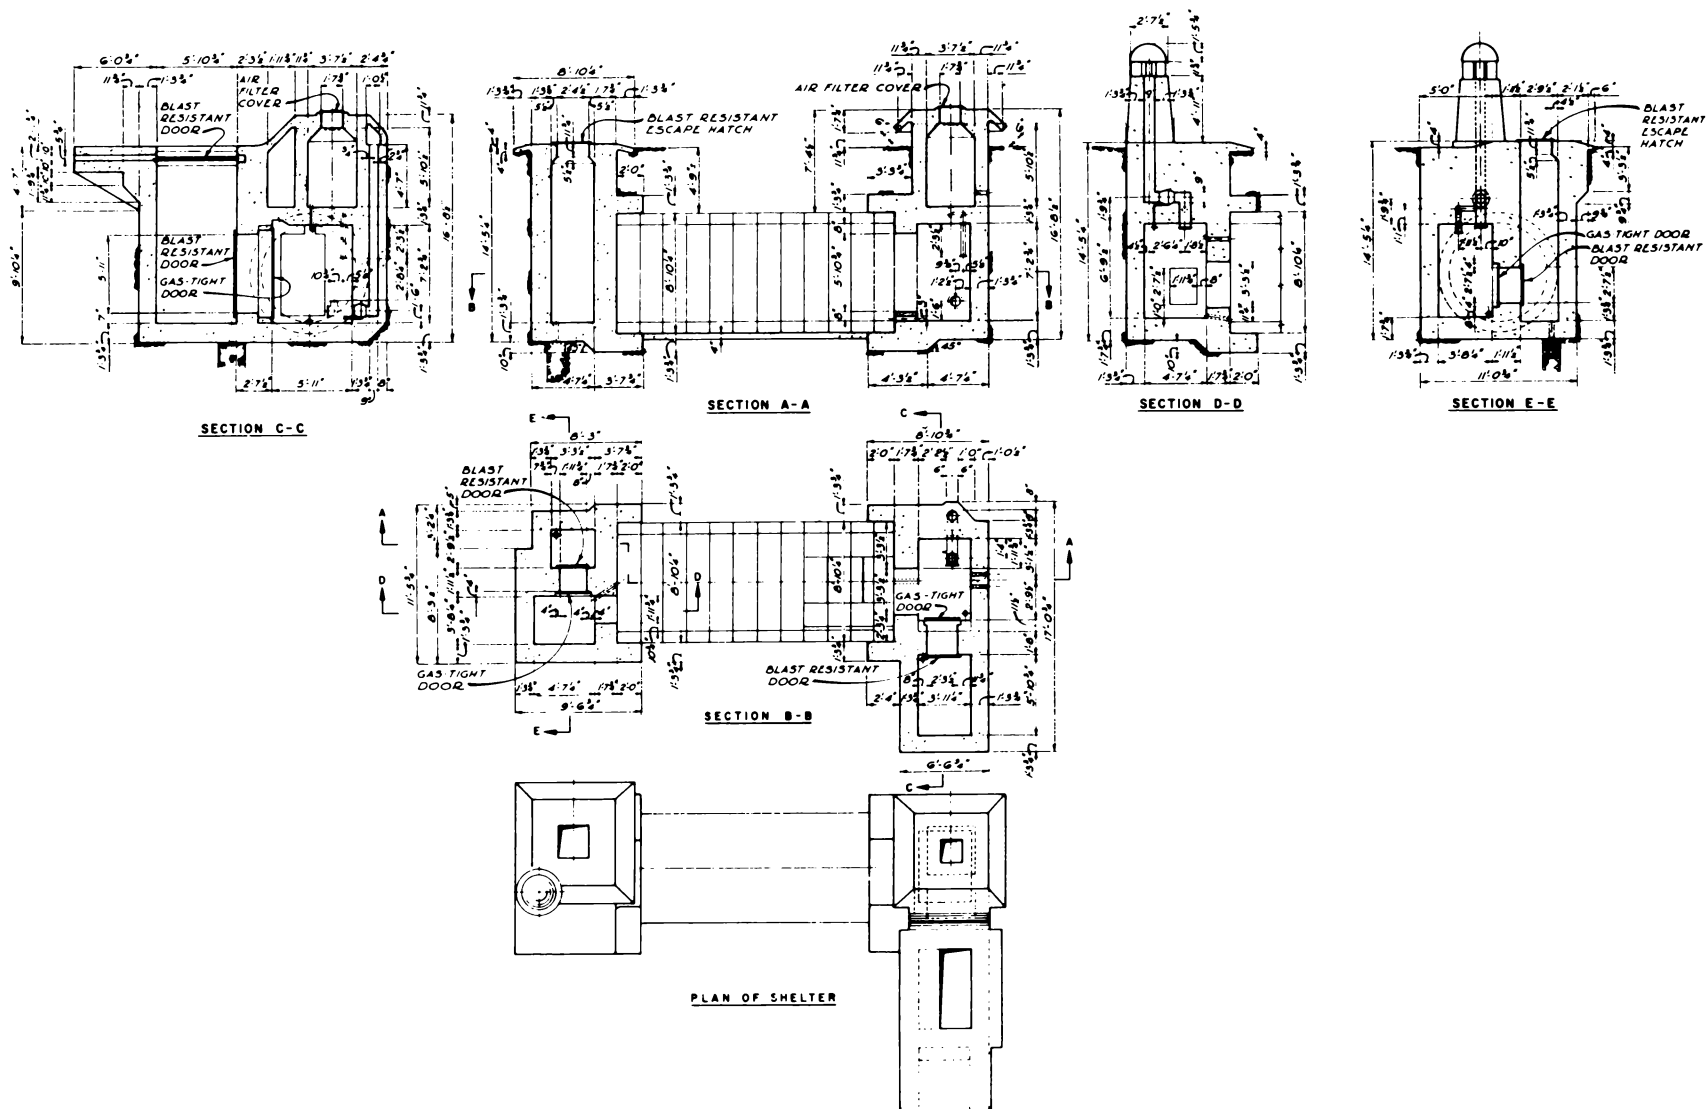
Circular shelter, type 50, structure II-2, architectural layout.
